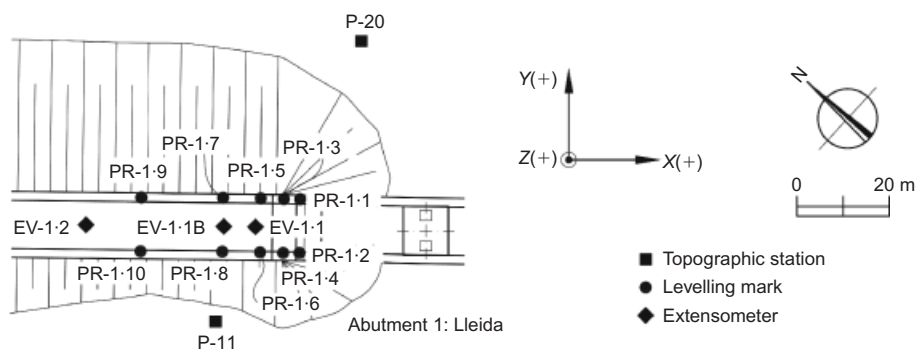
Position of surveying topographic stations, levelling marks and continuous extensometers in Lleida embankment
